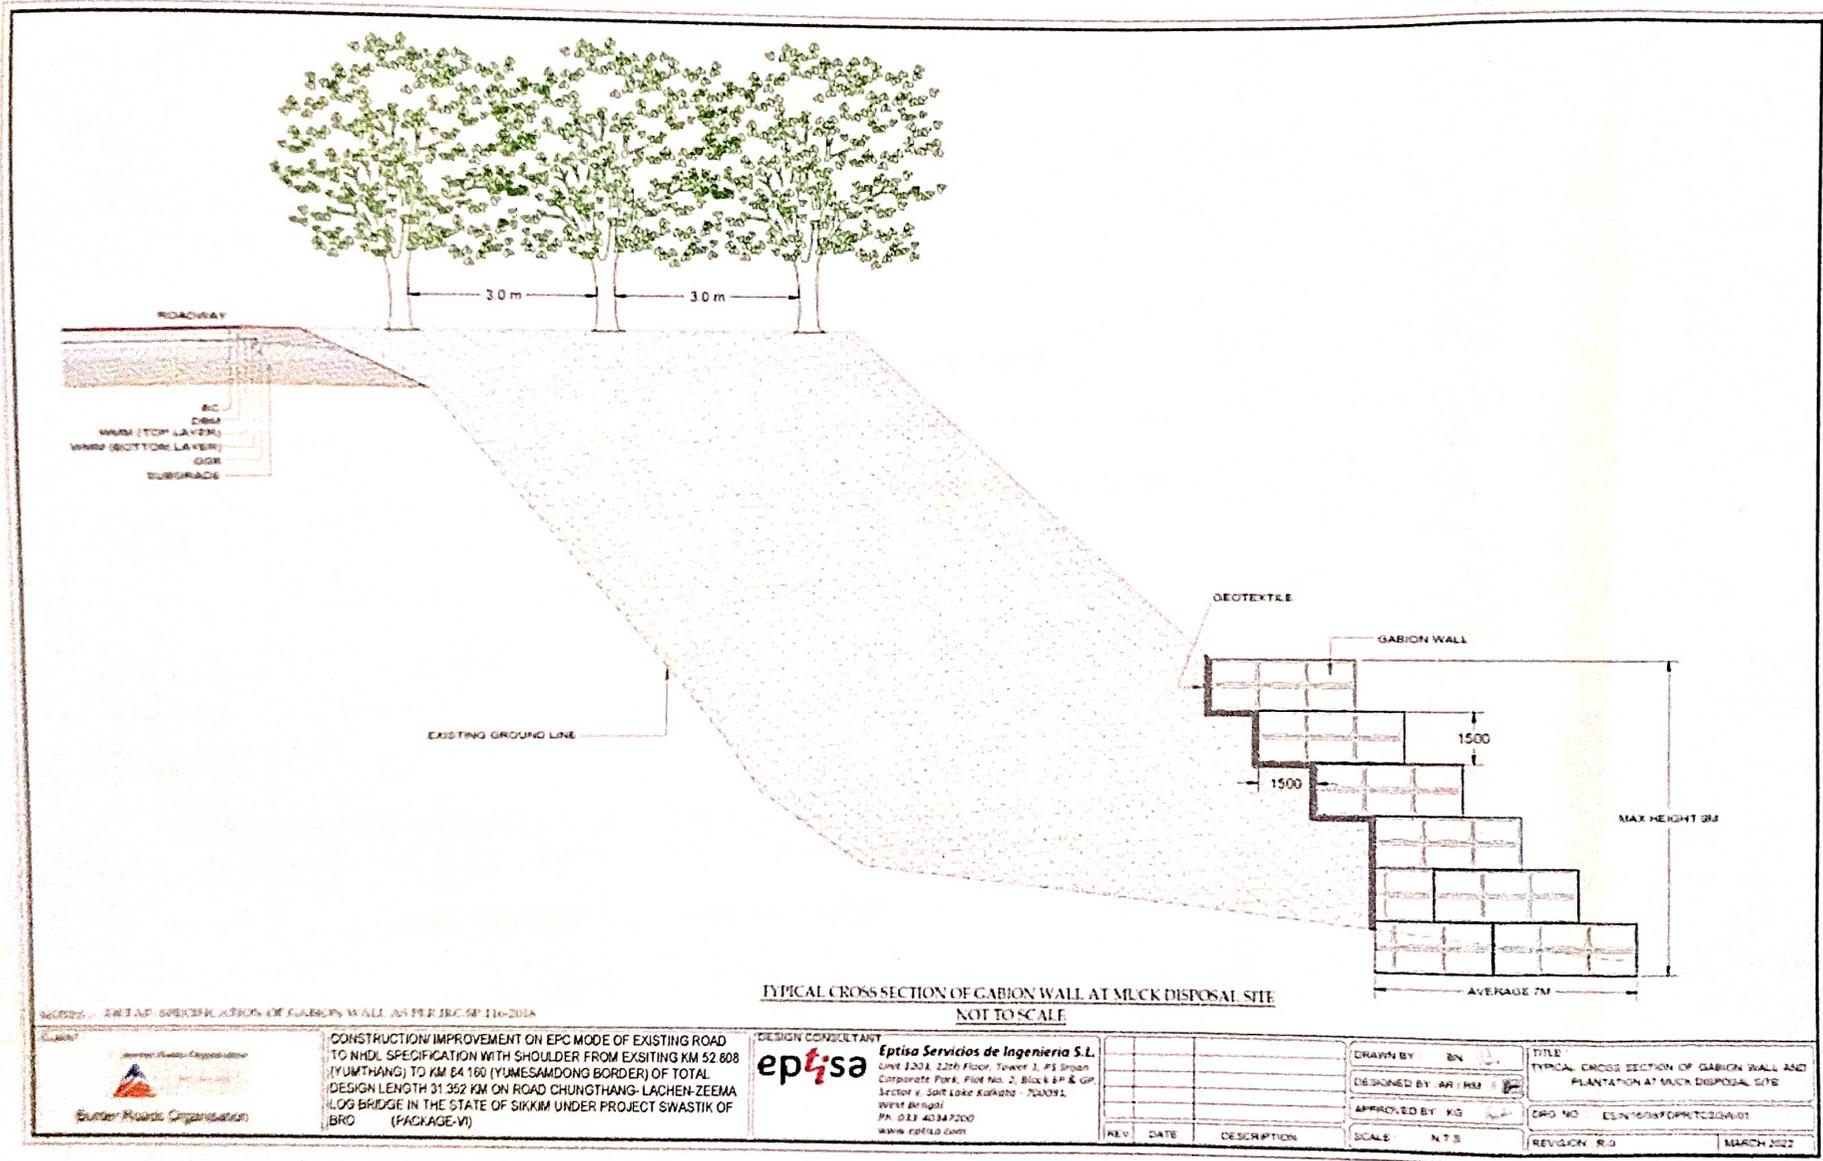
Typical Cross Section of Gabion Wall at Muck Disposal Site
